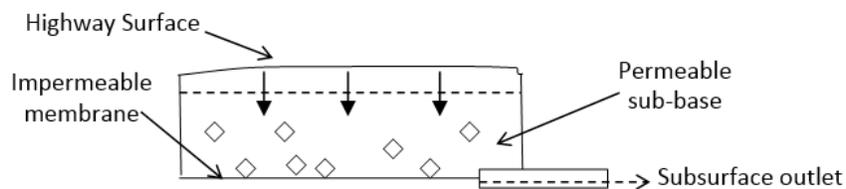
TYPICAL CROSS SECTION OF PERMEABLE PAVEMENT
